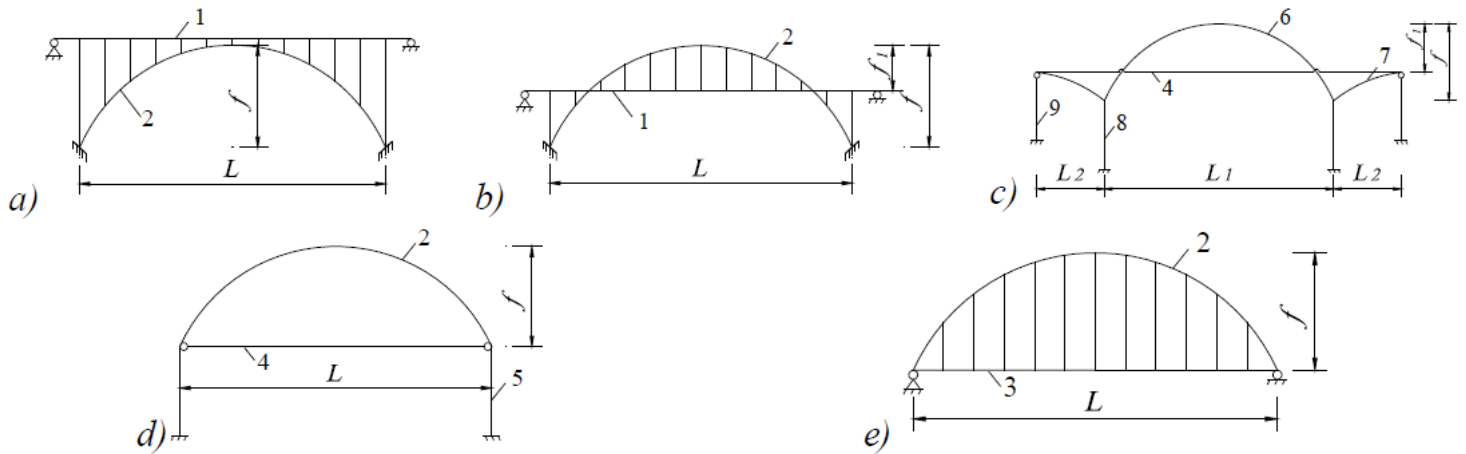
Main structural types of CFST Arches: a) Deck-arch b) Half-through arch c) Rigid-frame tied half-through arch ('Flying Bird') d) Rigid-frame tied through arch e) Arch and girder combined structure
